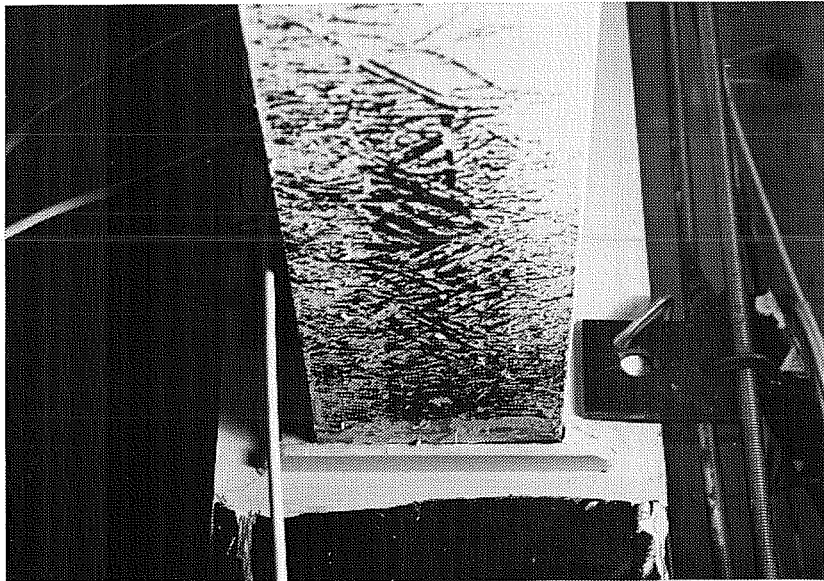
Crack Initiation at Bottom Flange of Specimen 8
